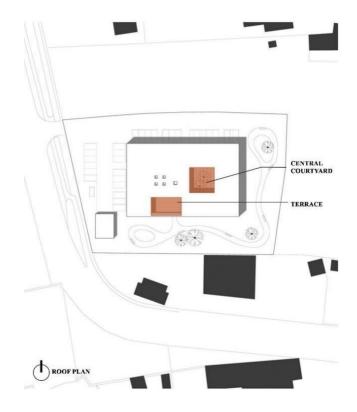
Roof plan; Source: arch daily and retraced by Author.
